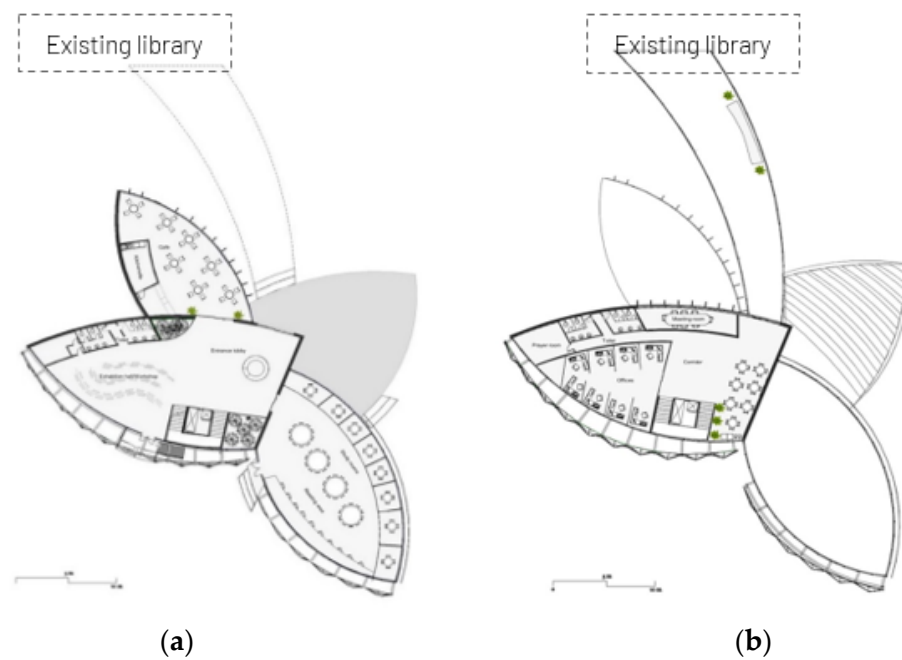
(a) Architectural ground floor plan, (b) architectural first floor plan.
